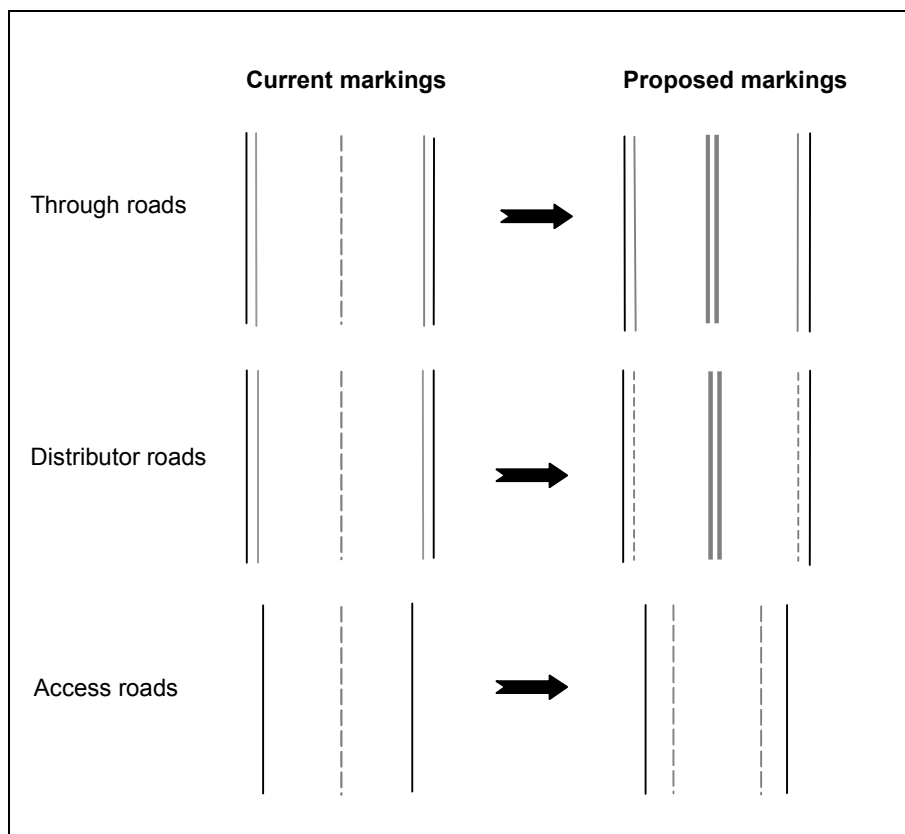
Differences between current and proposed markings for roads outside urban areas per road type.
